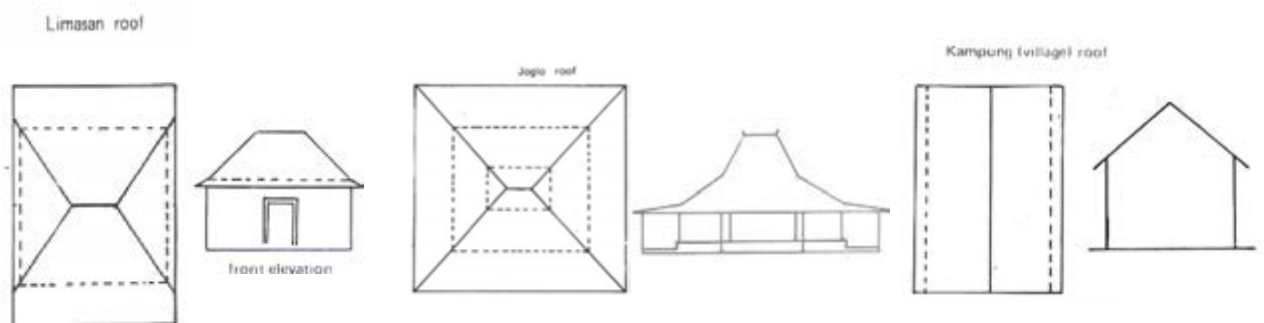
Yogyakarta and Javanese house roof types (source: Sumintardja.Dj)
